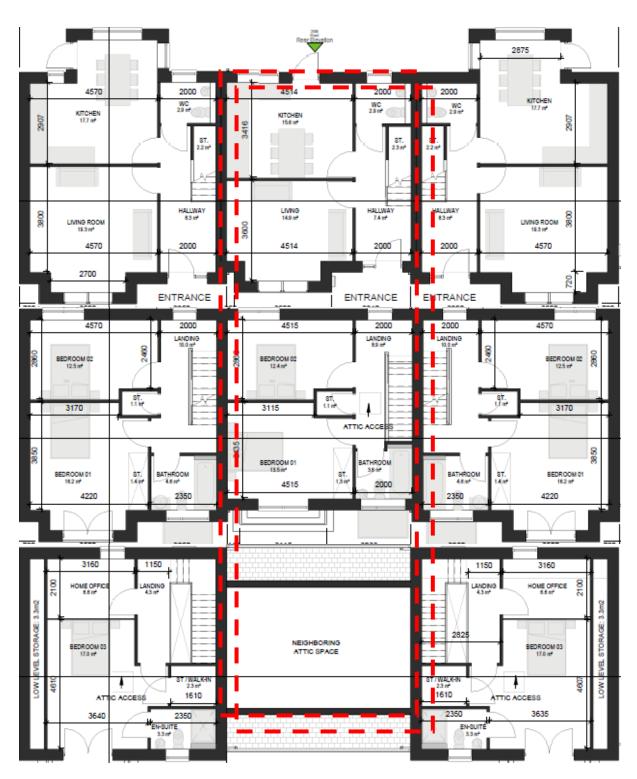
Typical ground floor plan of House Type 6.2 (top), typical first floor plan of House Types 6.2 (centre) and typical second floor (roof) plan of House Type 6.2 (bottom). The area within the red dashed lines represents the ground, first and second floor plans for House Types 6.1 & 6.3.
